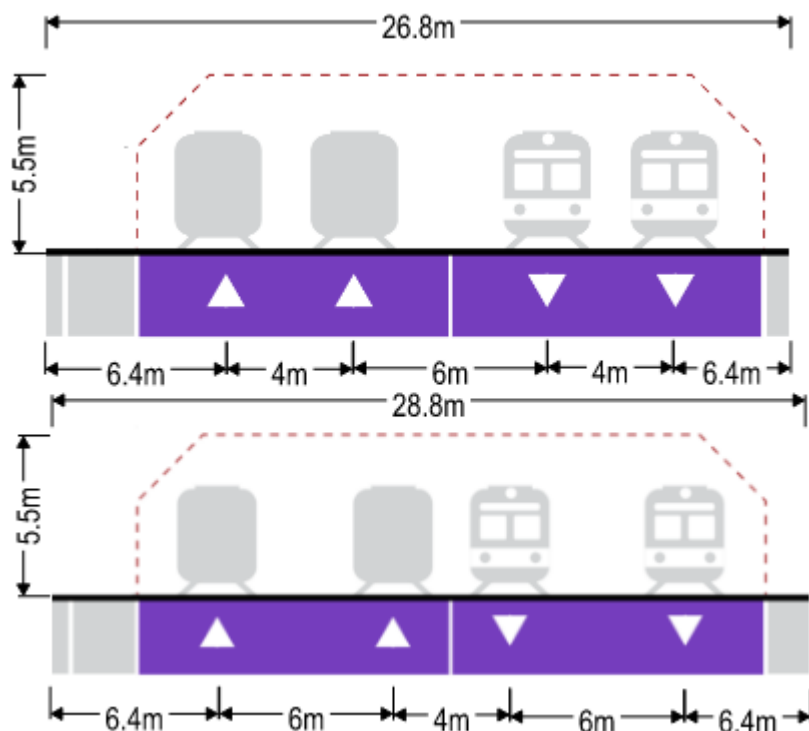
Absolute minimum clearance requirements for four-tracking, with two future tracks to one side of existing tracks (top) and a future track to either side of existing tracks (bottom).
